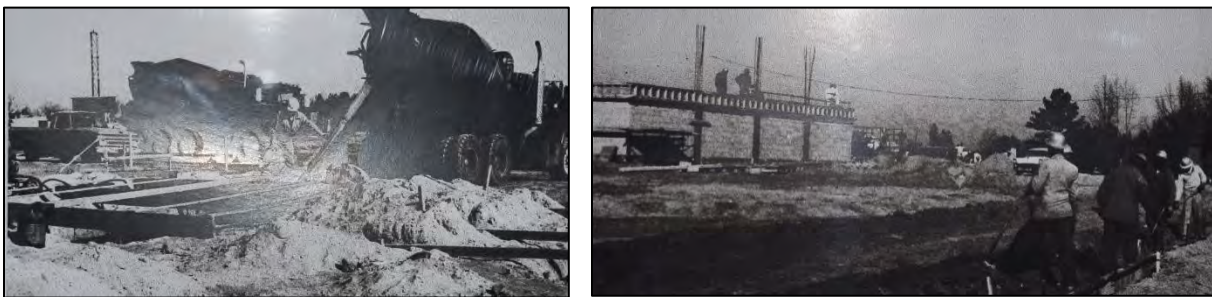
At left, concrete footings being poured “for the multipurpose organic production plant”; at right, structural walls of the office building going up, 1966
